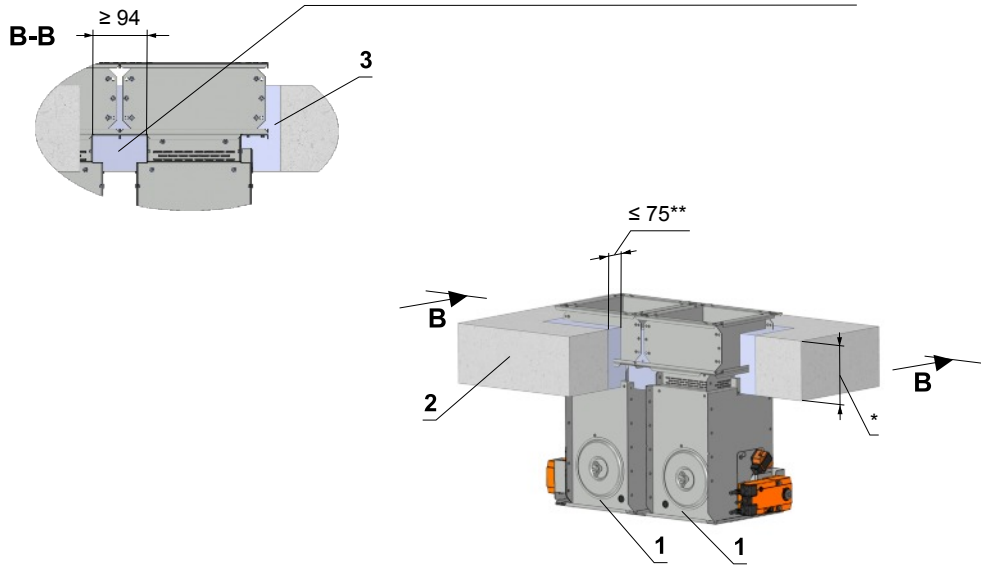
Solid ceiling construction - battery - mortar or gypsum
